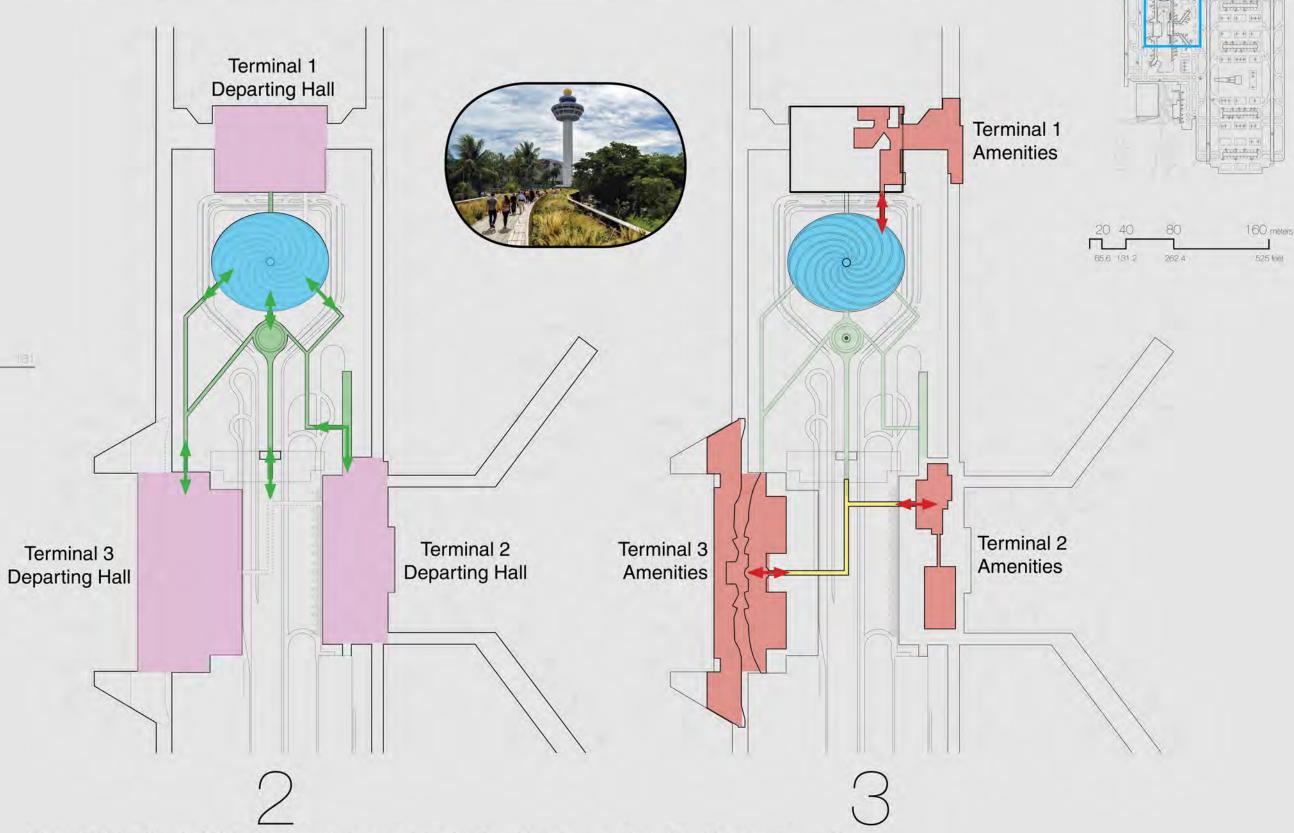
Plan: Terminal Mall – Inter-terminal connectivity plan. Level 2 to departure halls, Level 3 to transit amenities.
